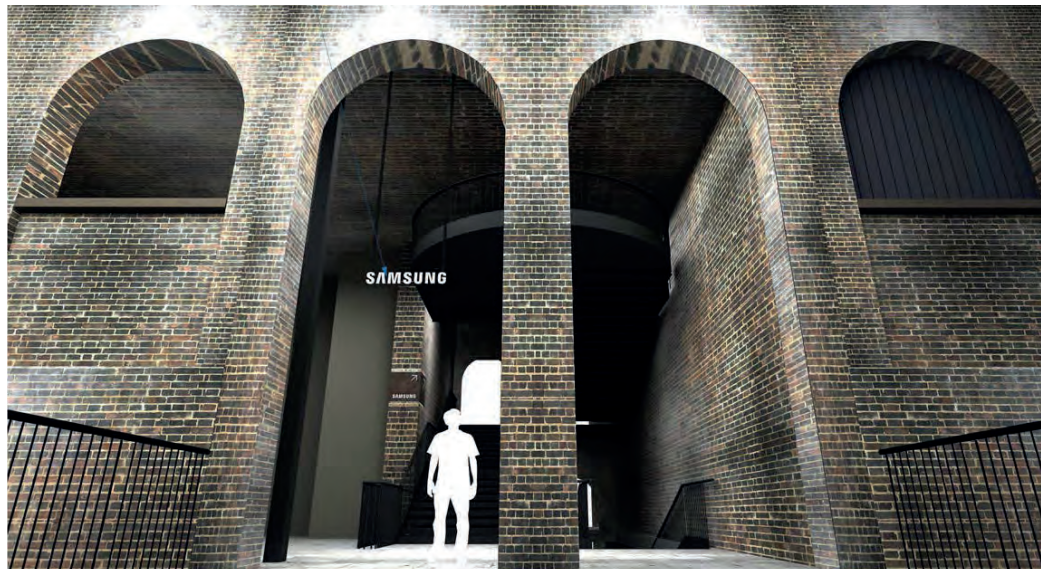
(opposite): Visualisation showing the proposed new column signage on the west elevation
